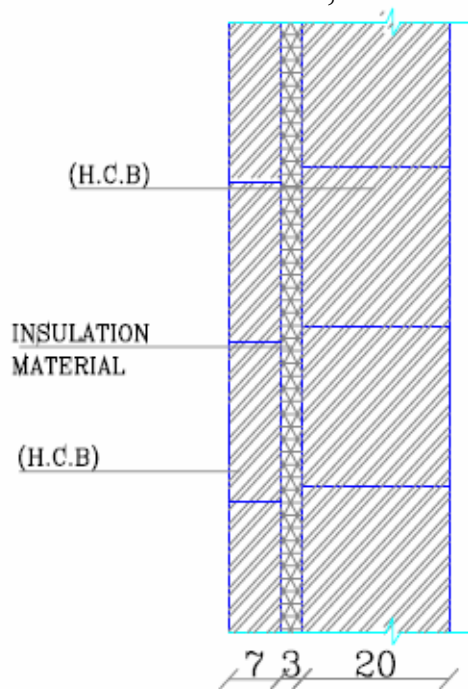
Exterior wall built from two walls of concrete blocks with polystyrene plates layer in between.
